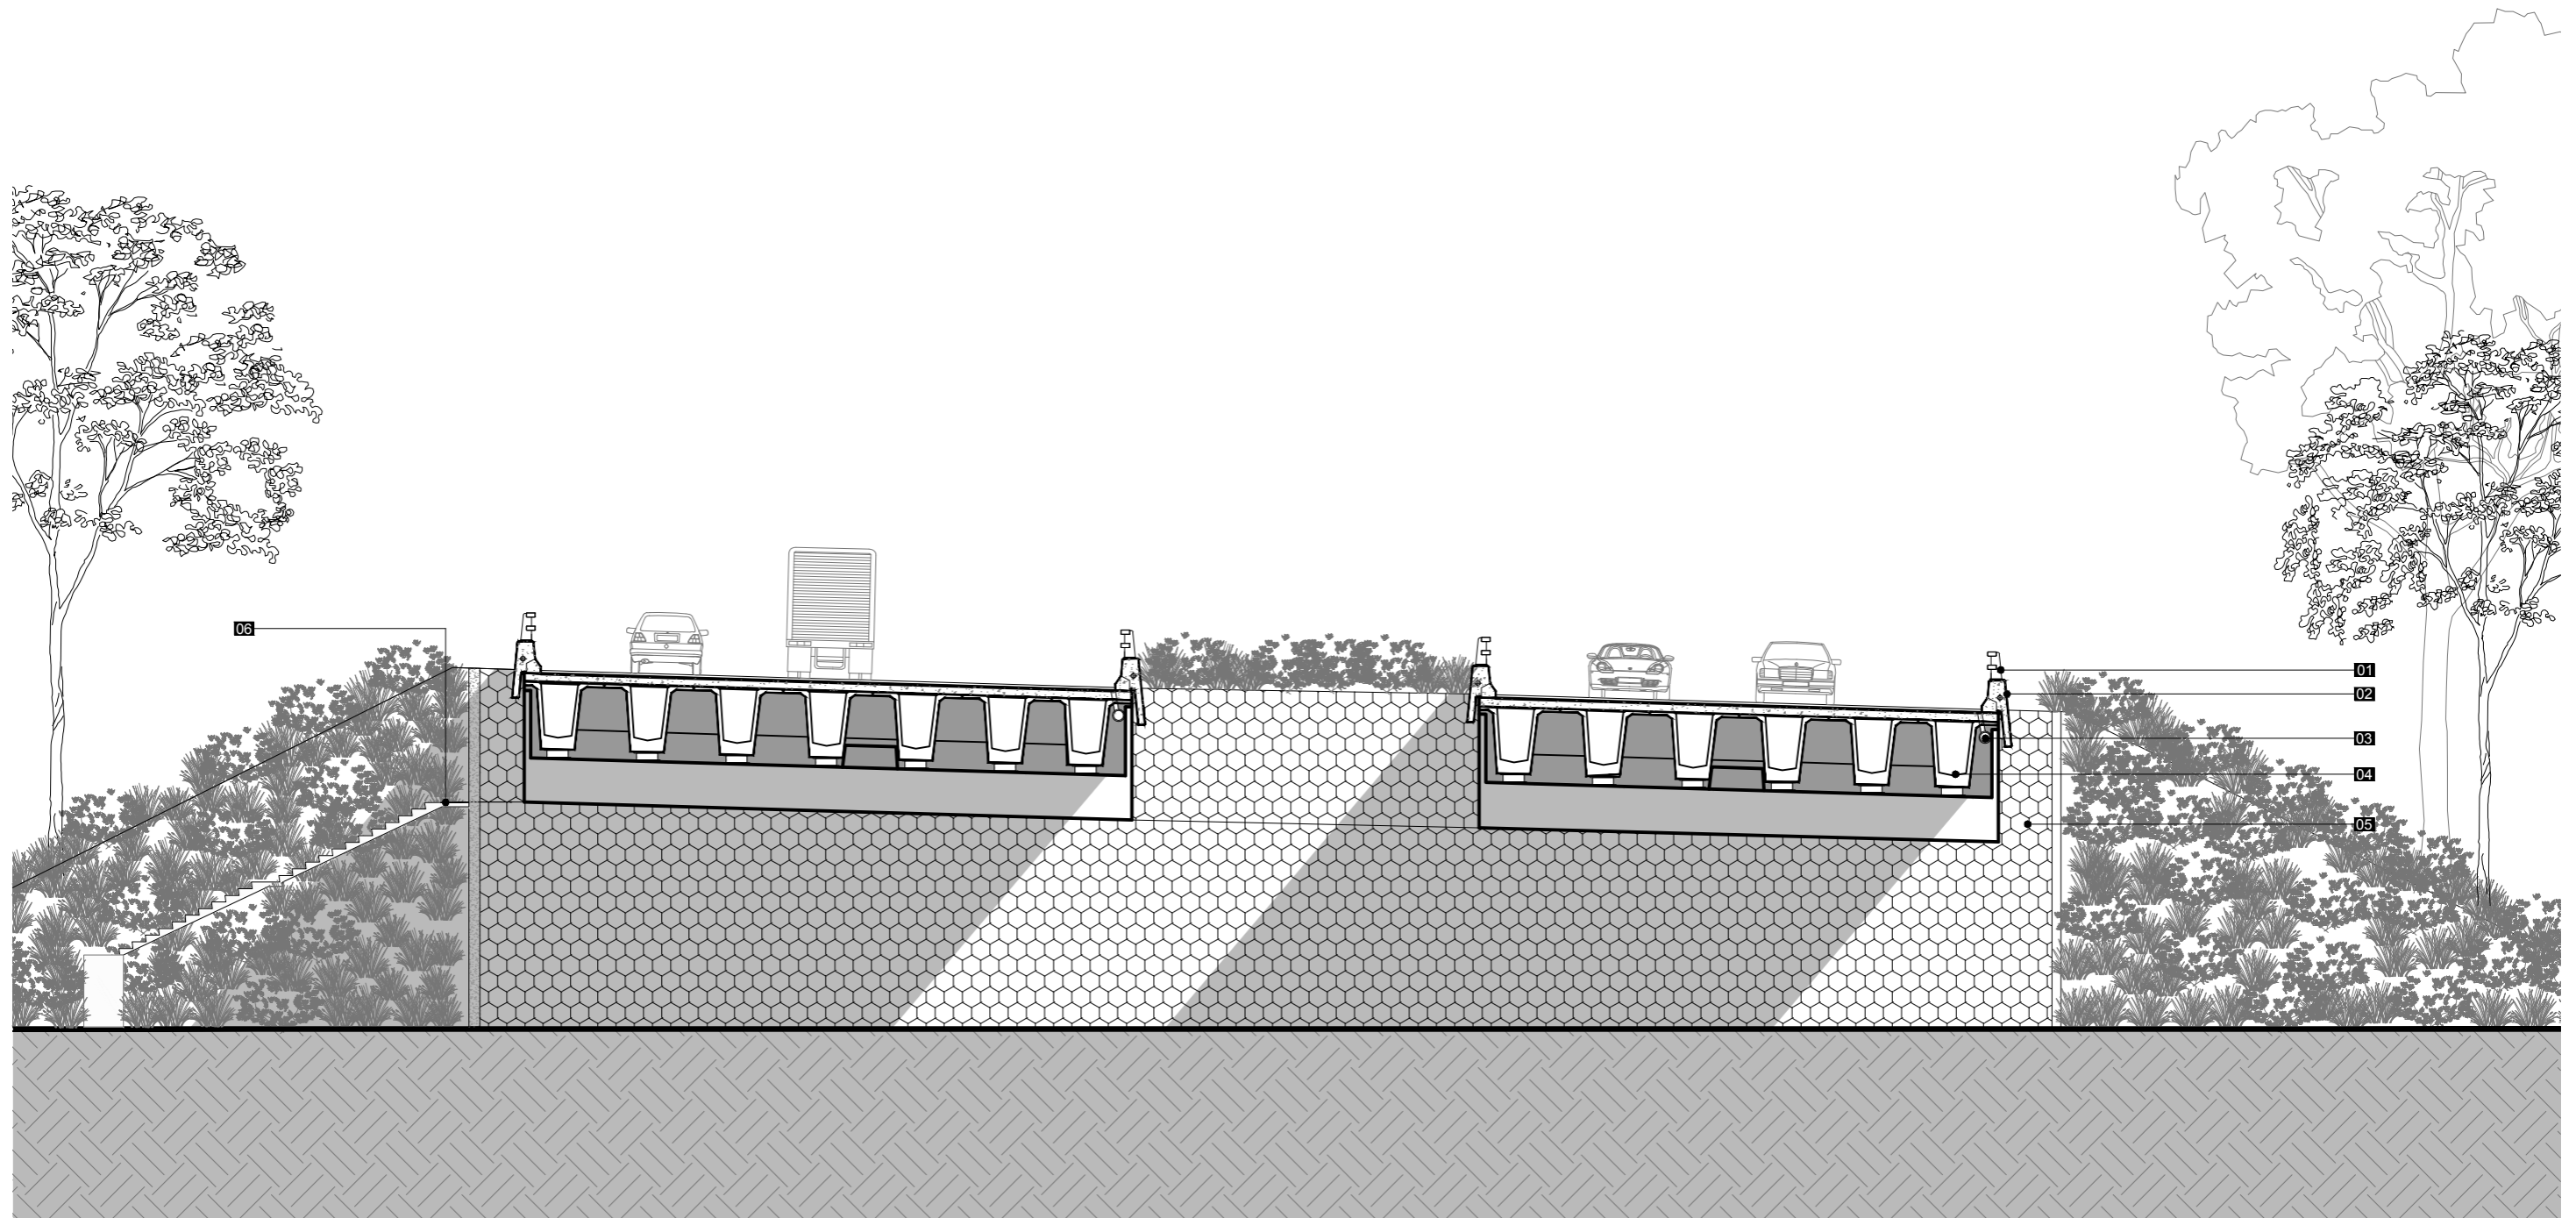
Twin bridges over Valla Road: Elevation
